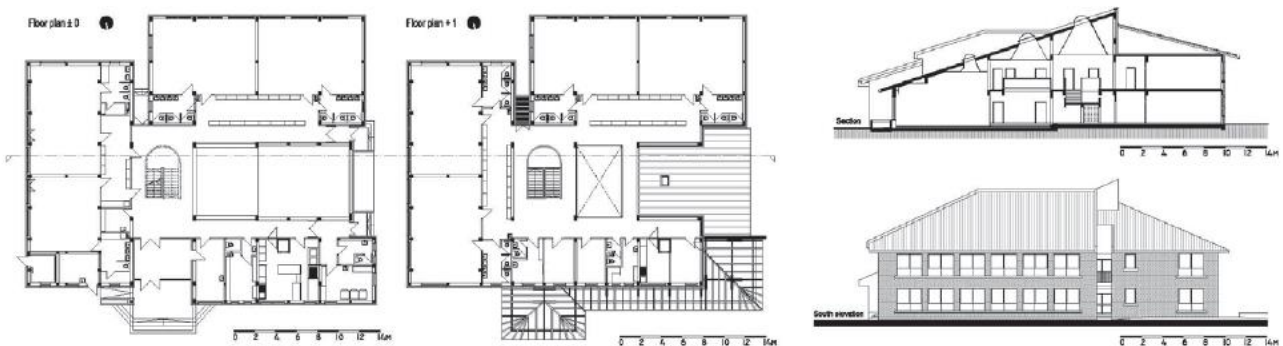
Floor plan, section and elevation of the Petar Pan kindergarten
